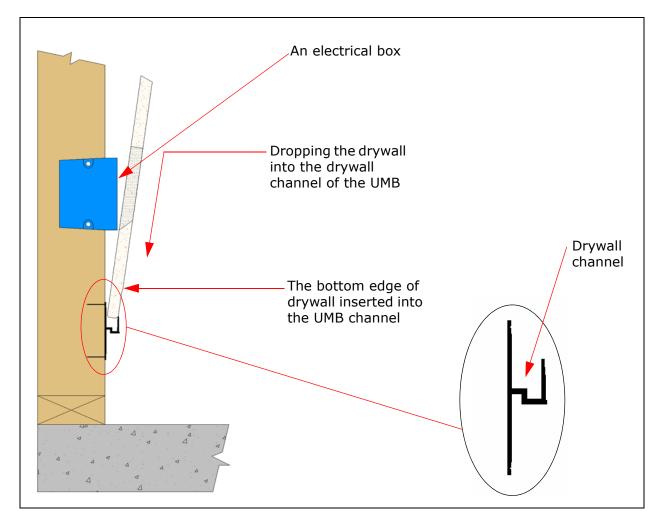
, next, shows how to slip the drywall into the drywall channel of the UMB.
